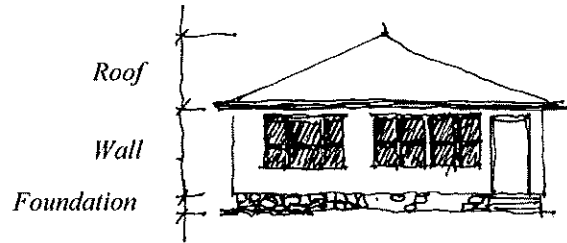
Exterior appearance should divide the volume into: roof, walls, and foundation.
